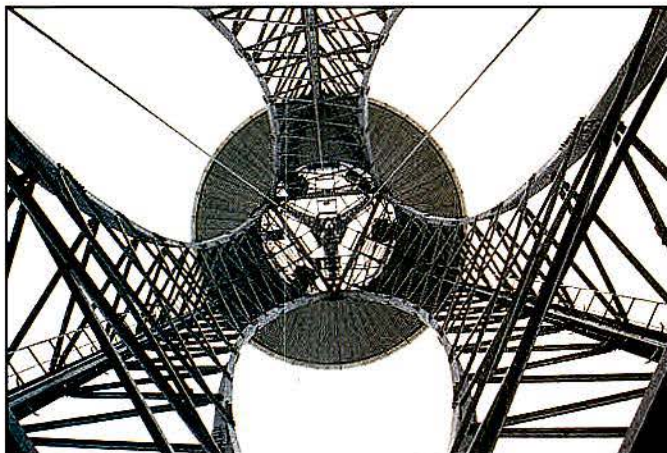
The landing platforms at each elevated room span the space between the room and the interior of the tower.
